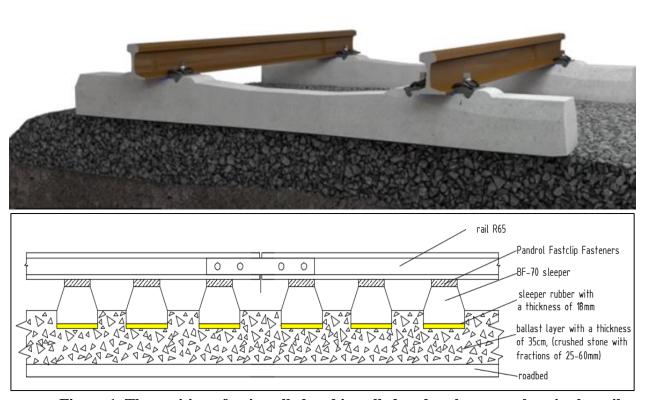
The position of uninstalled and installed under-sleeper gaskets in the rail joint area.
